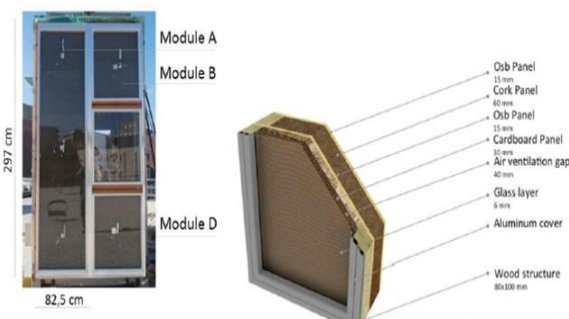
A solar timber facade system for building refurbishment (Callegari et al. 2015)
